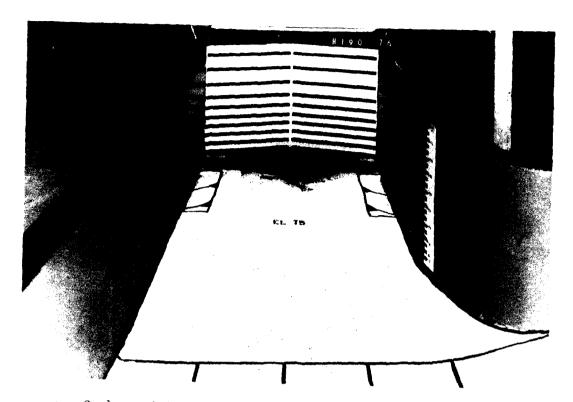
Maximum discharge and flow conditions for emptying operations with 4-min valve; type 10 design outlet area; initial head 3.5 ft; initial lock chamber el 121.7; lower pool el 118.2
